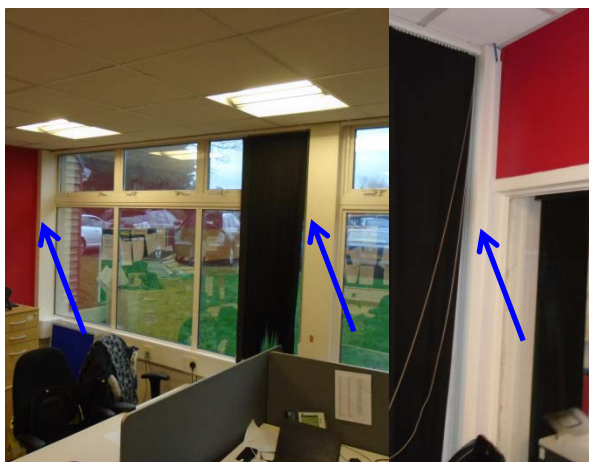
G.02 Office Corridor -- Asbestos Insulating Board (AIB) infill panels previously identified below windows to G.14 Gym. Now over-clad.
